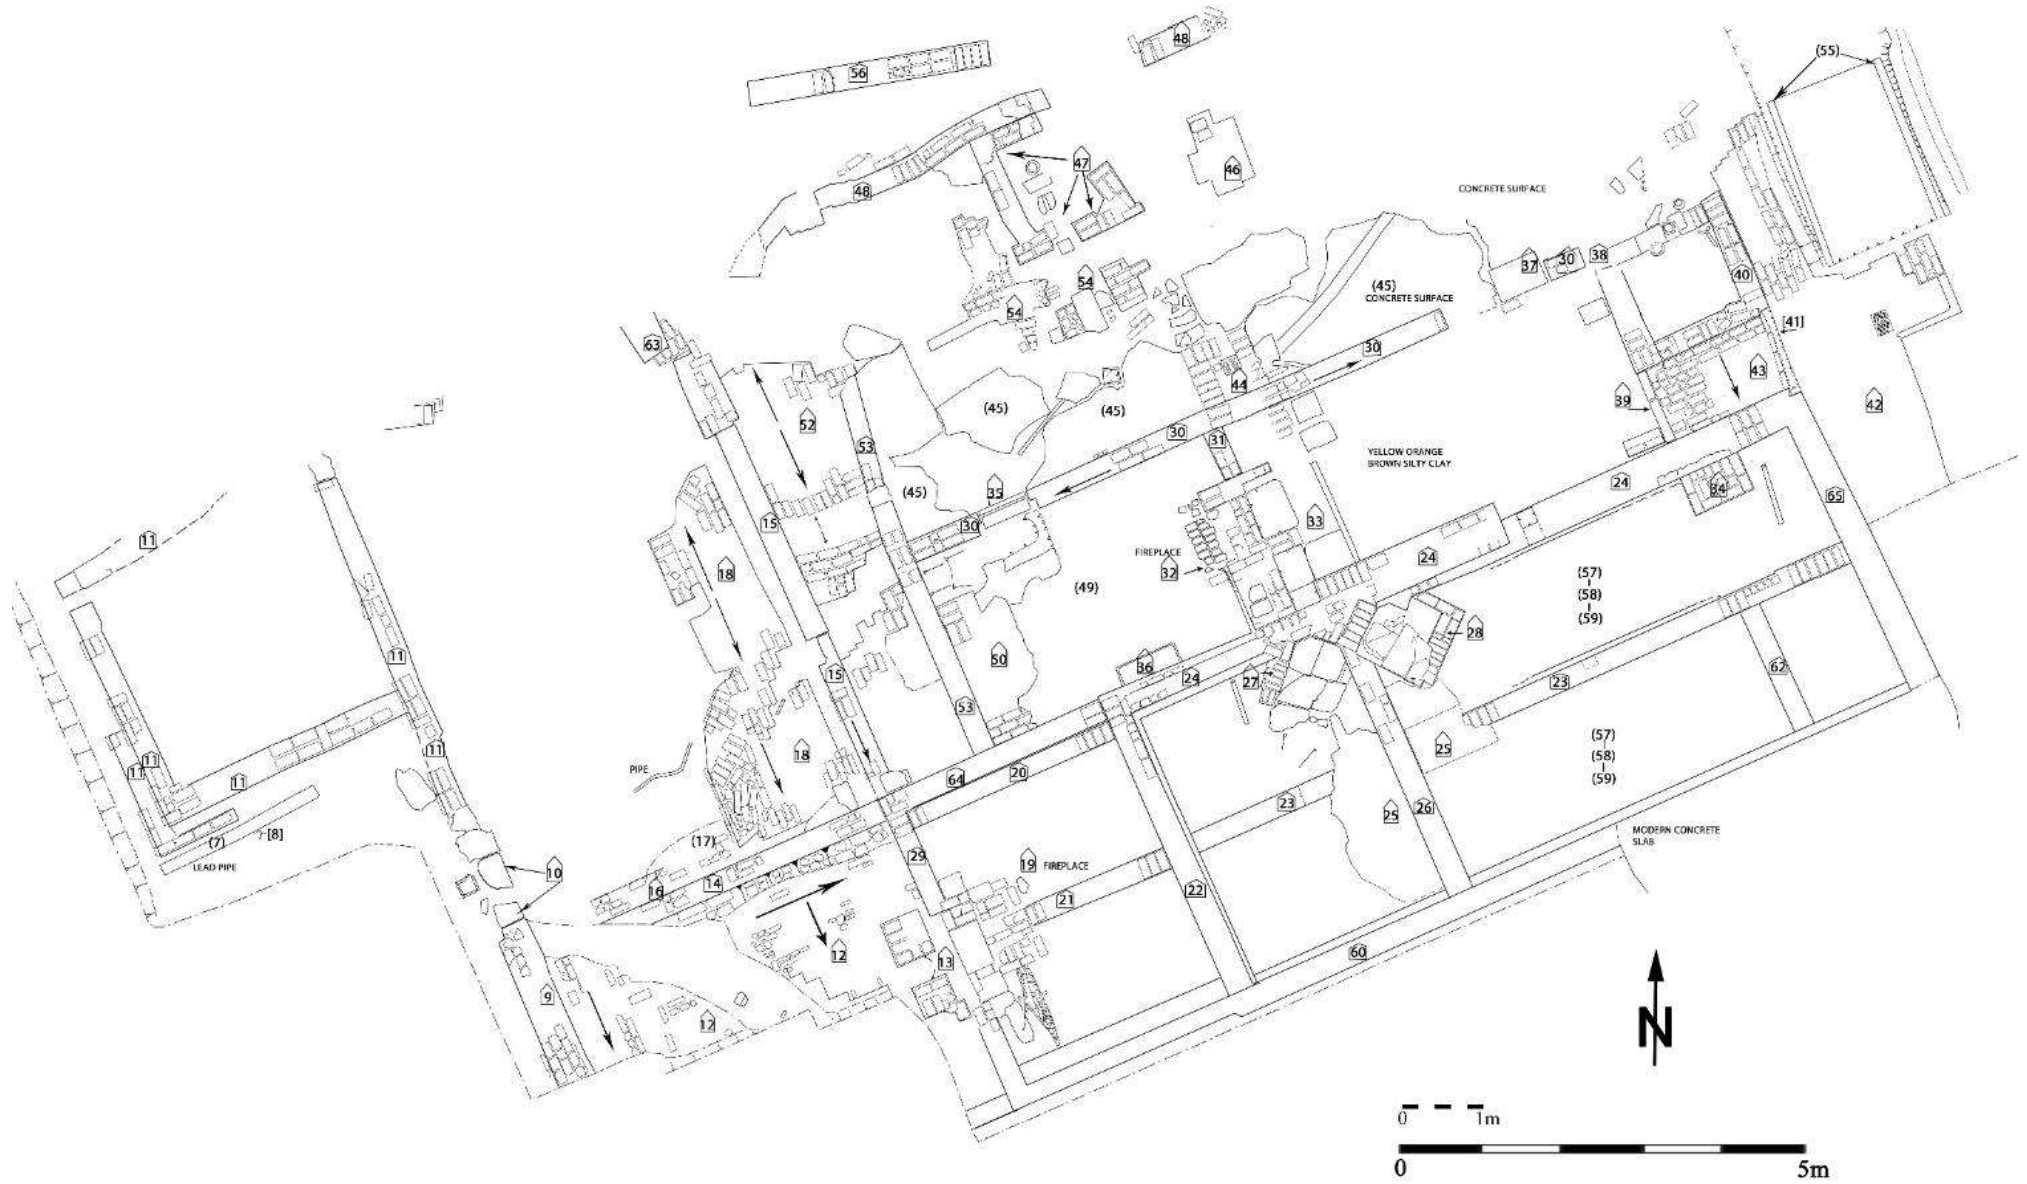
Plan of lock-keepers cottage. Original drawn at 1:20.
